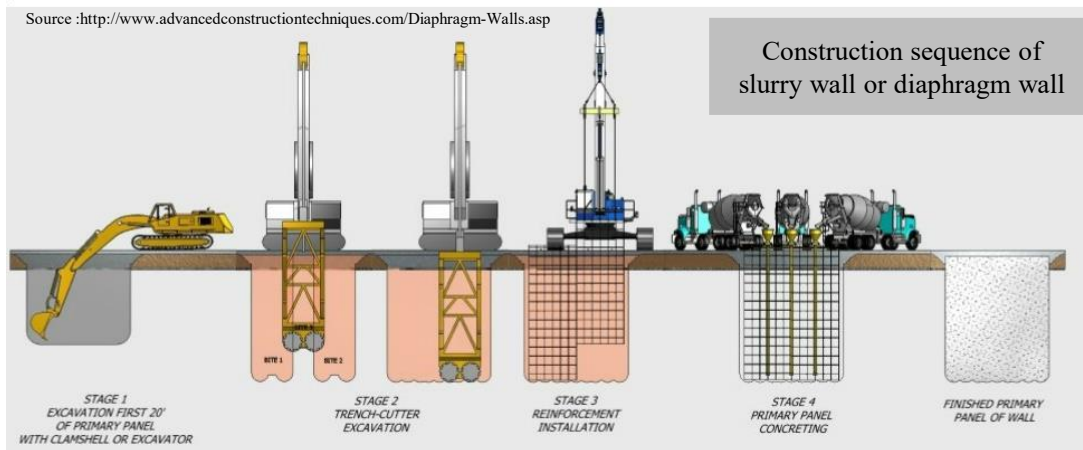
Cast in-situ walls (Diaphragm wall)
